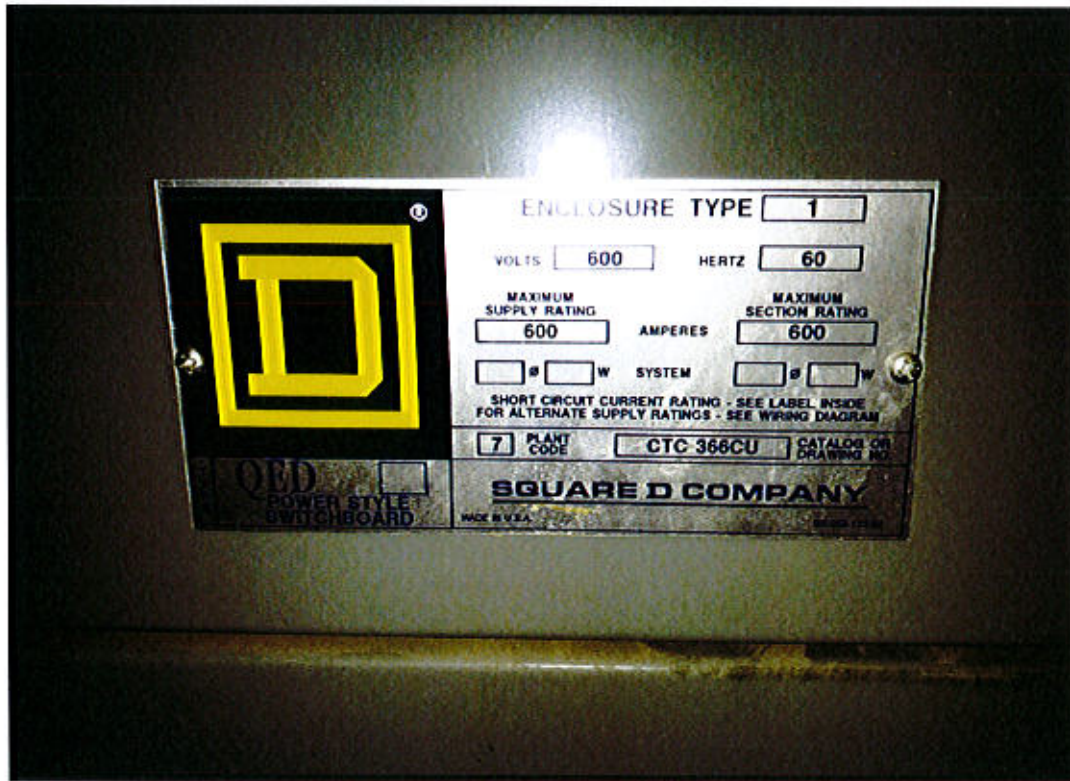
Hartford Bridge & Electrical Maintenance Facility –
